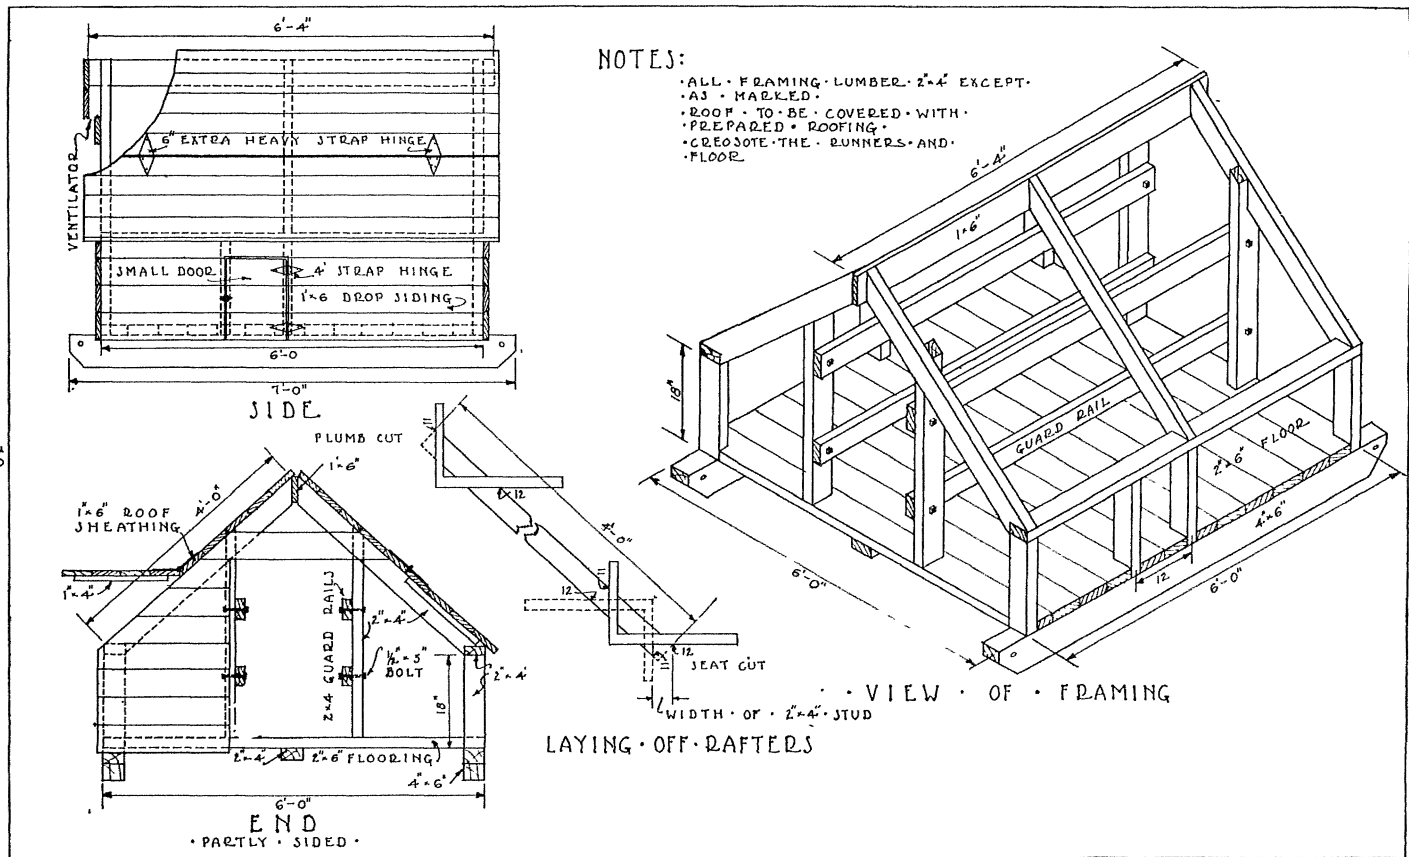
A 6' x 6' gable roof house. Note the farrowing rails described on page 18.
